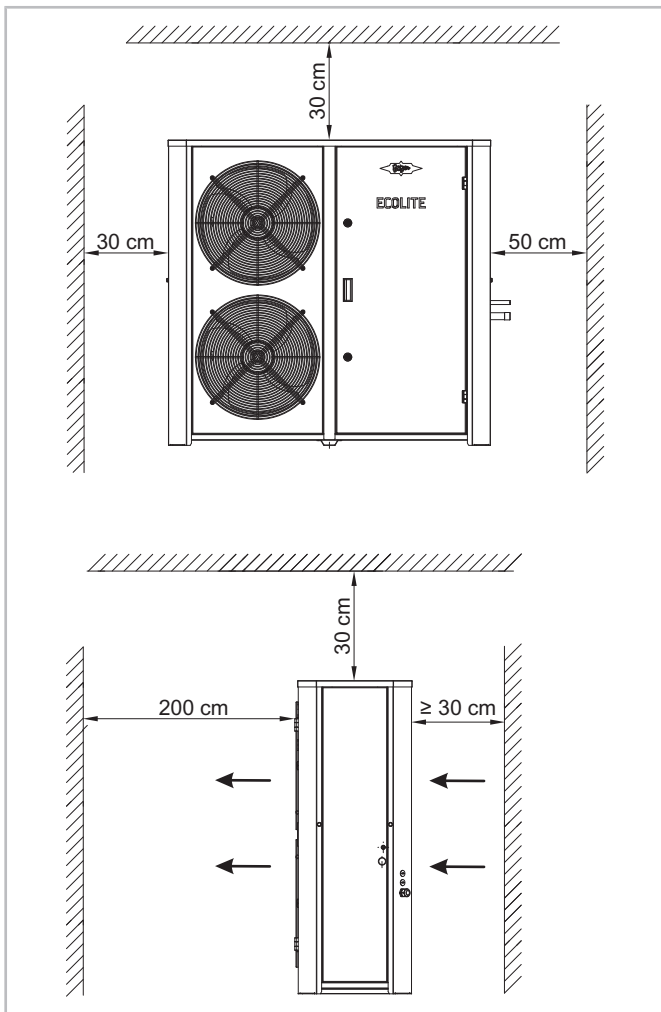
Minimum distances to the wall and ceiling (example shows LHL5E/ ..)
